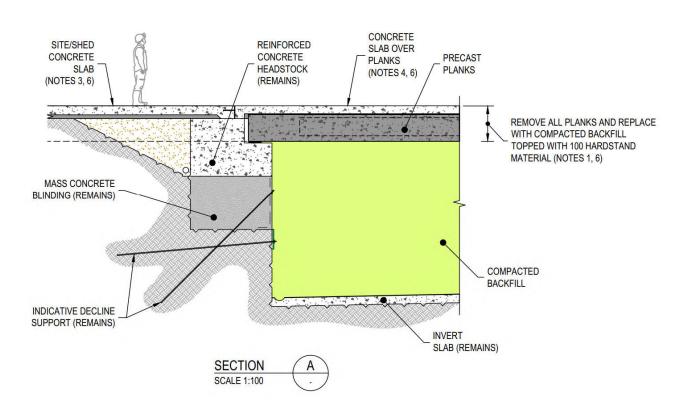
Design of PBR Access Backfill and Stub Walls (sheet 2 of 3)
